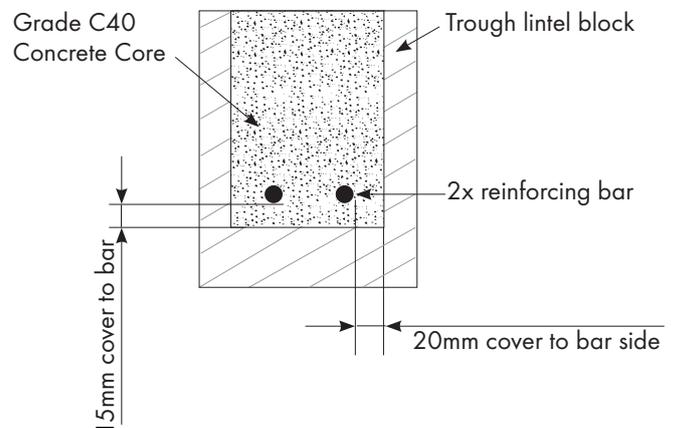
Typical detail of Lintel with Double Reinforcing Bar.
